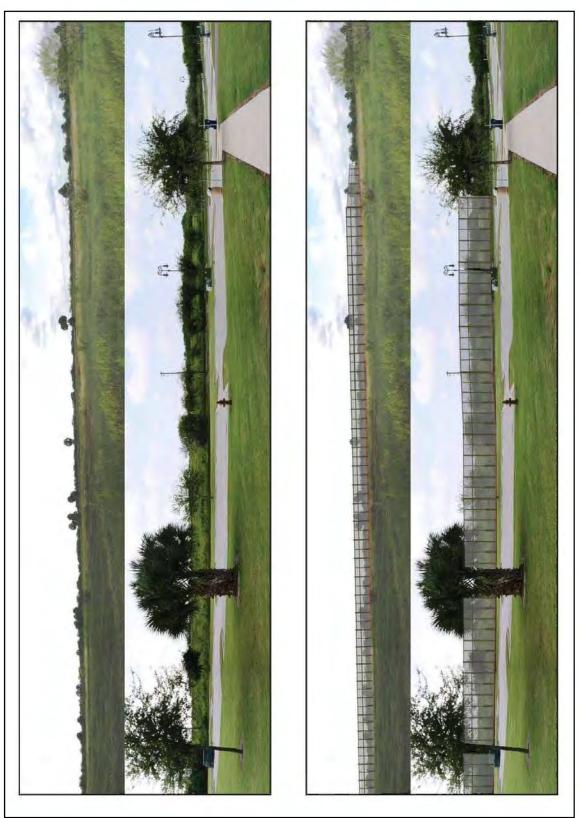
Typical Views Towards Proposed Project Corridor, Showing How the Park/Refuge Land Unit Would Appear with a Fence and Patrol Road
